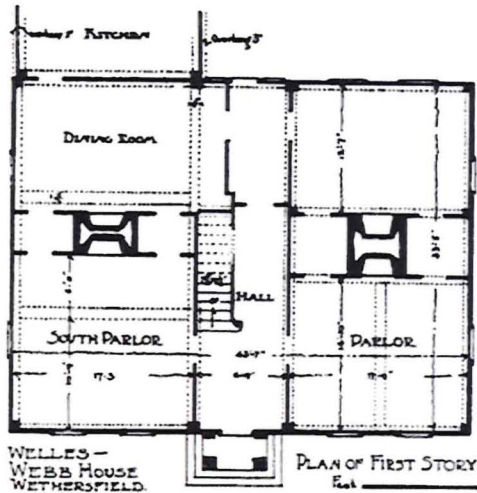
Typical first floor plan in Connecticut ca. 1775 of the central hall type (Kelly Book page 16)
